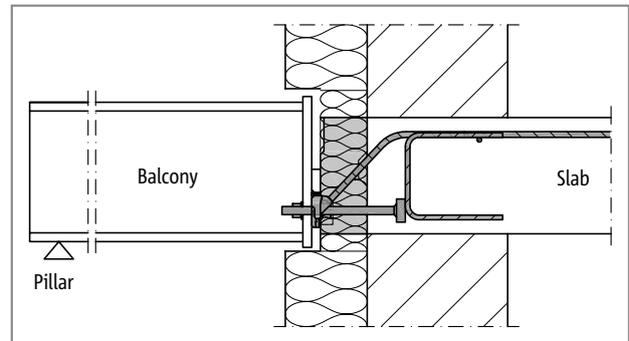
Schöck Isokorb® T type SQ: Connection to reinforced concrete inner slab; insulating element within the core insulation zone.
